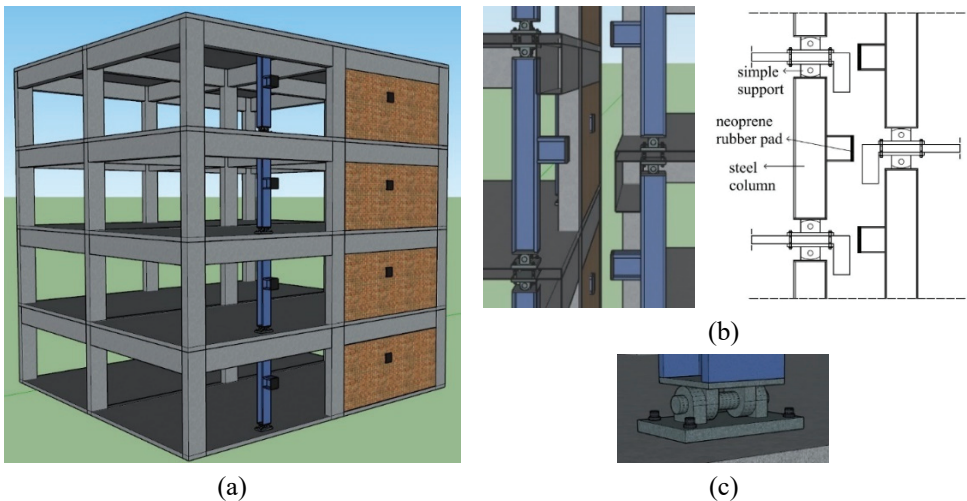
(a) Proposed retrofitting method, (b) sectional view of columns, (c) connection detail.
